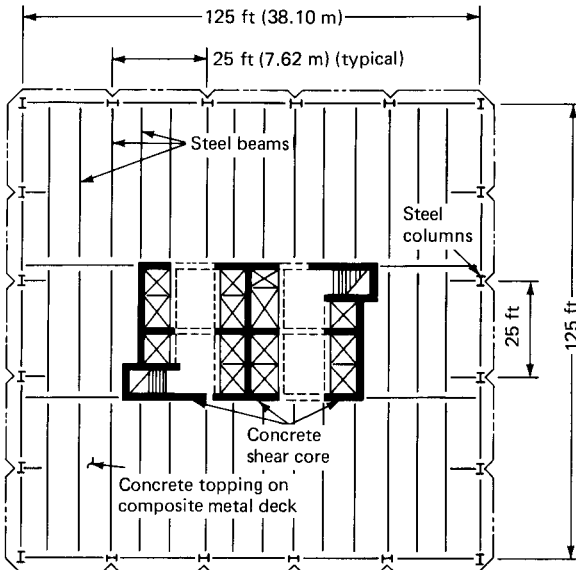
Typical floor plan of composite high-rise building with concrete core and steel surround.
